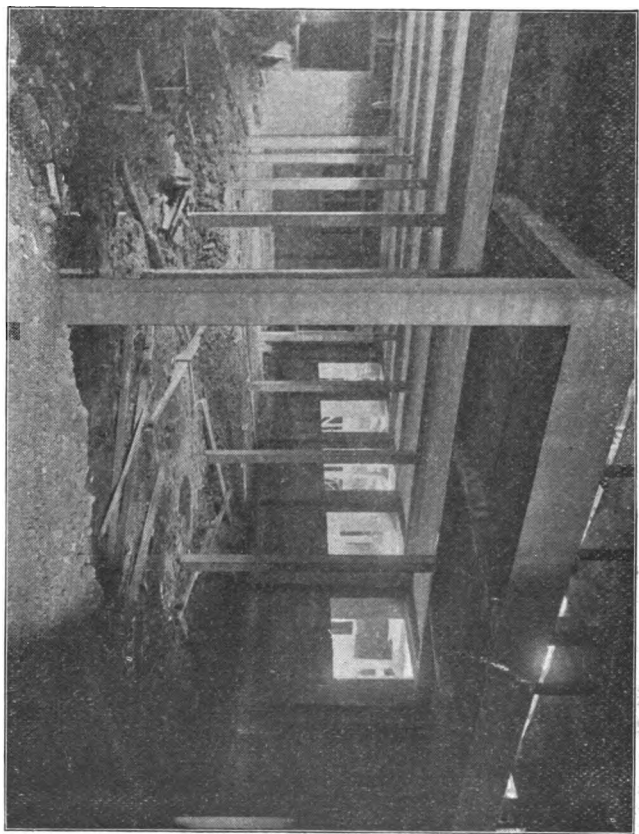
McKinley High School, St. Louis. Columns Supporting Auditorium Floor.
